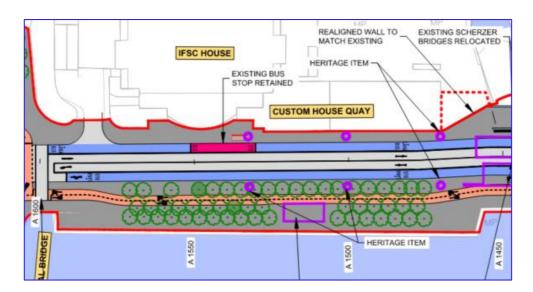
Proposed Road Layout on Custom House Quay, west of George's Dock
